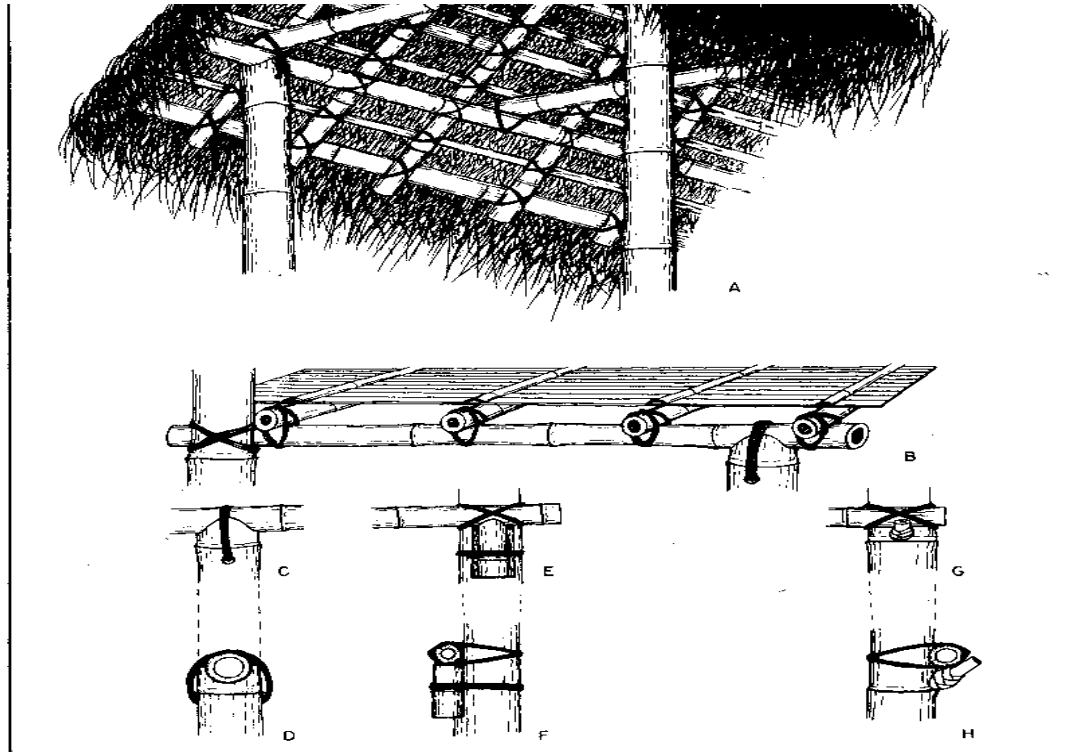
Details of bamboo construction: A, fitting and binding culms at joints in roof and frame; B, fitting and securing bamboo boards of floor; C and D, saddle joint; E and F, use of inset block to support horizontal load-bearing elements; G and H, use of stump of branch at node of post to support horizontal load-bearing elements.
